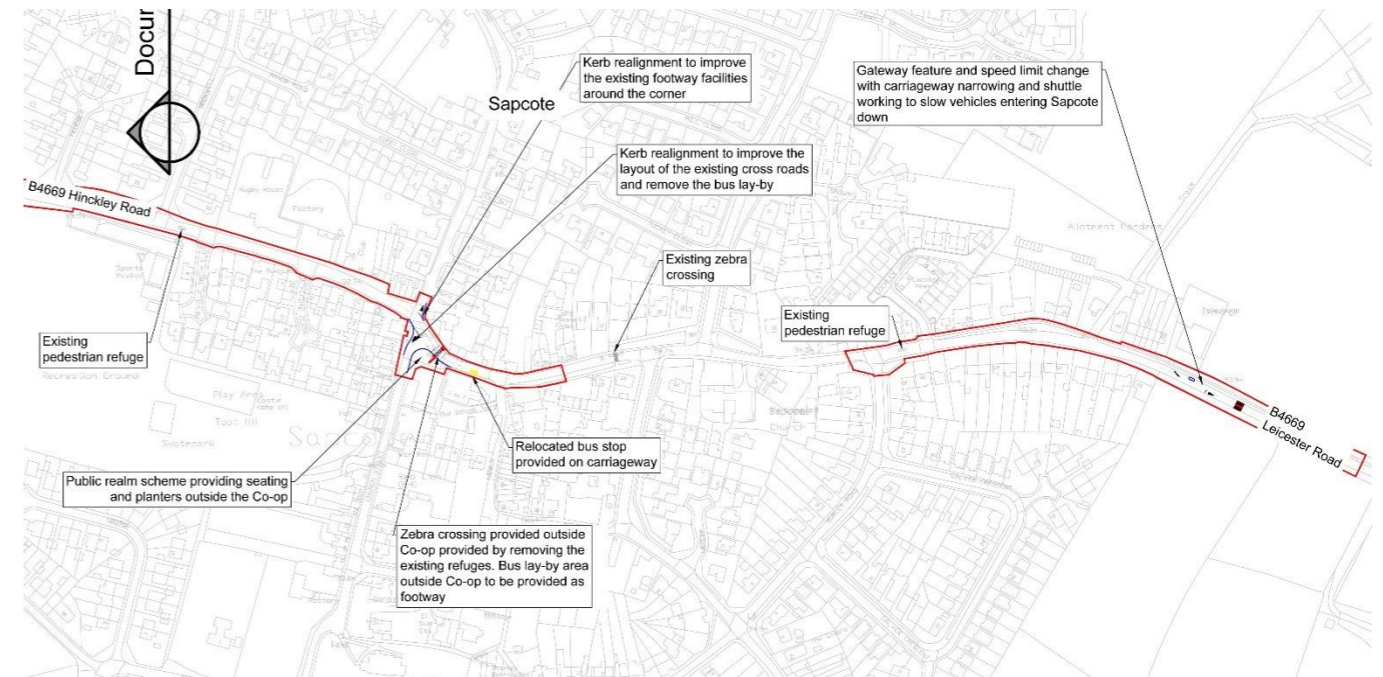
Proposed Works to the Hinckley Road / Leicester Road, Sapcote
